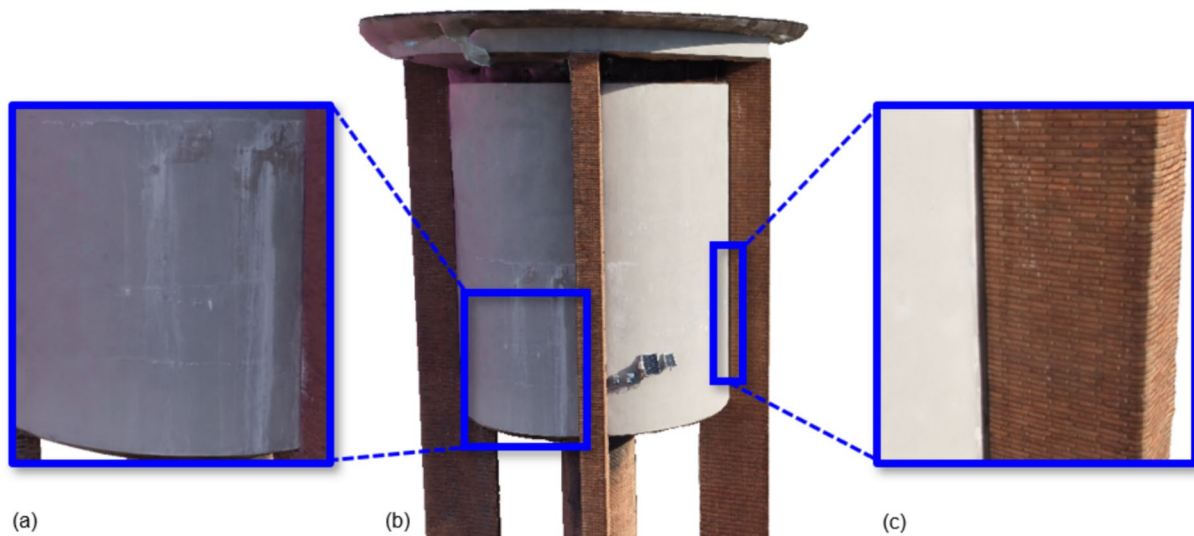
3D textured model of Tiburtina elevated water tank (b) with focus on specific details of water draining (a) and tank-to-column discontinuity (c)
